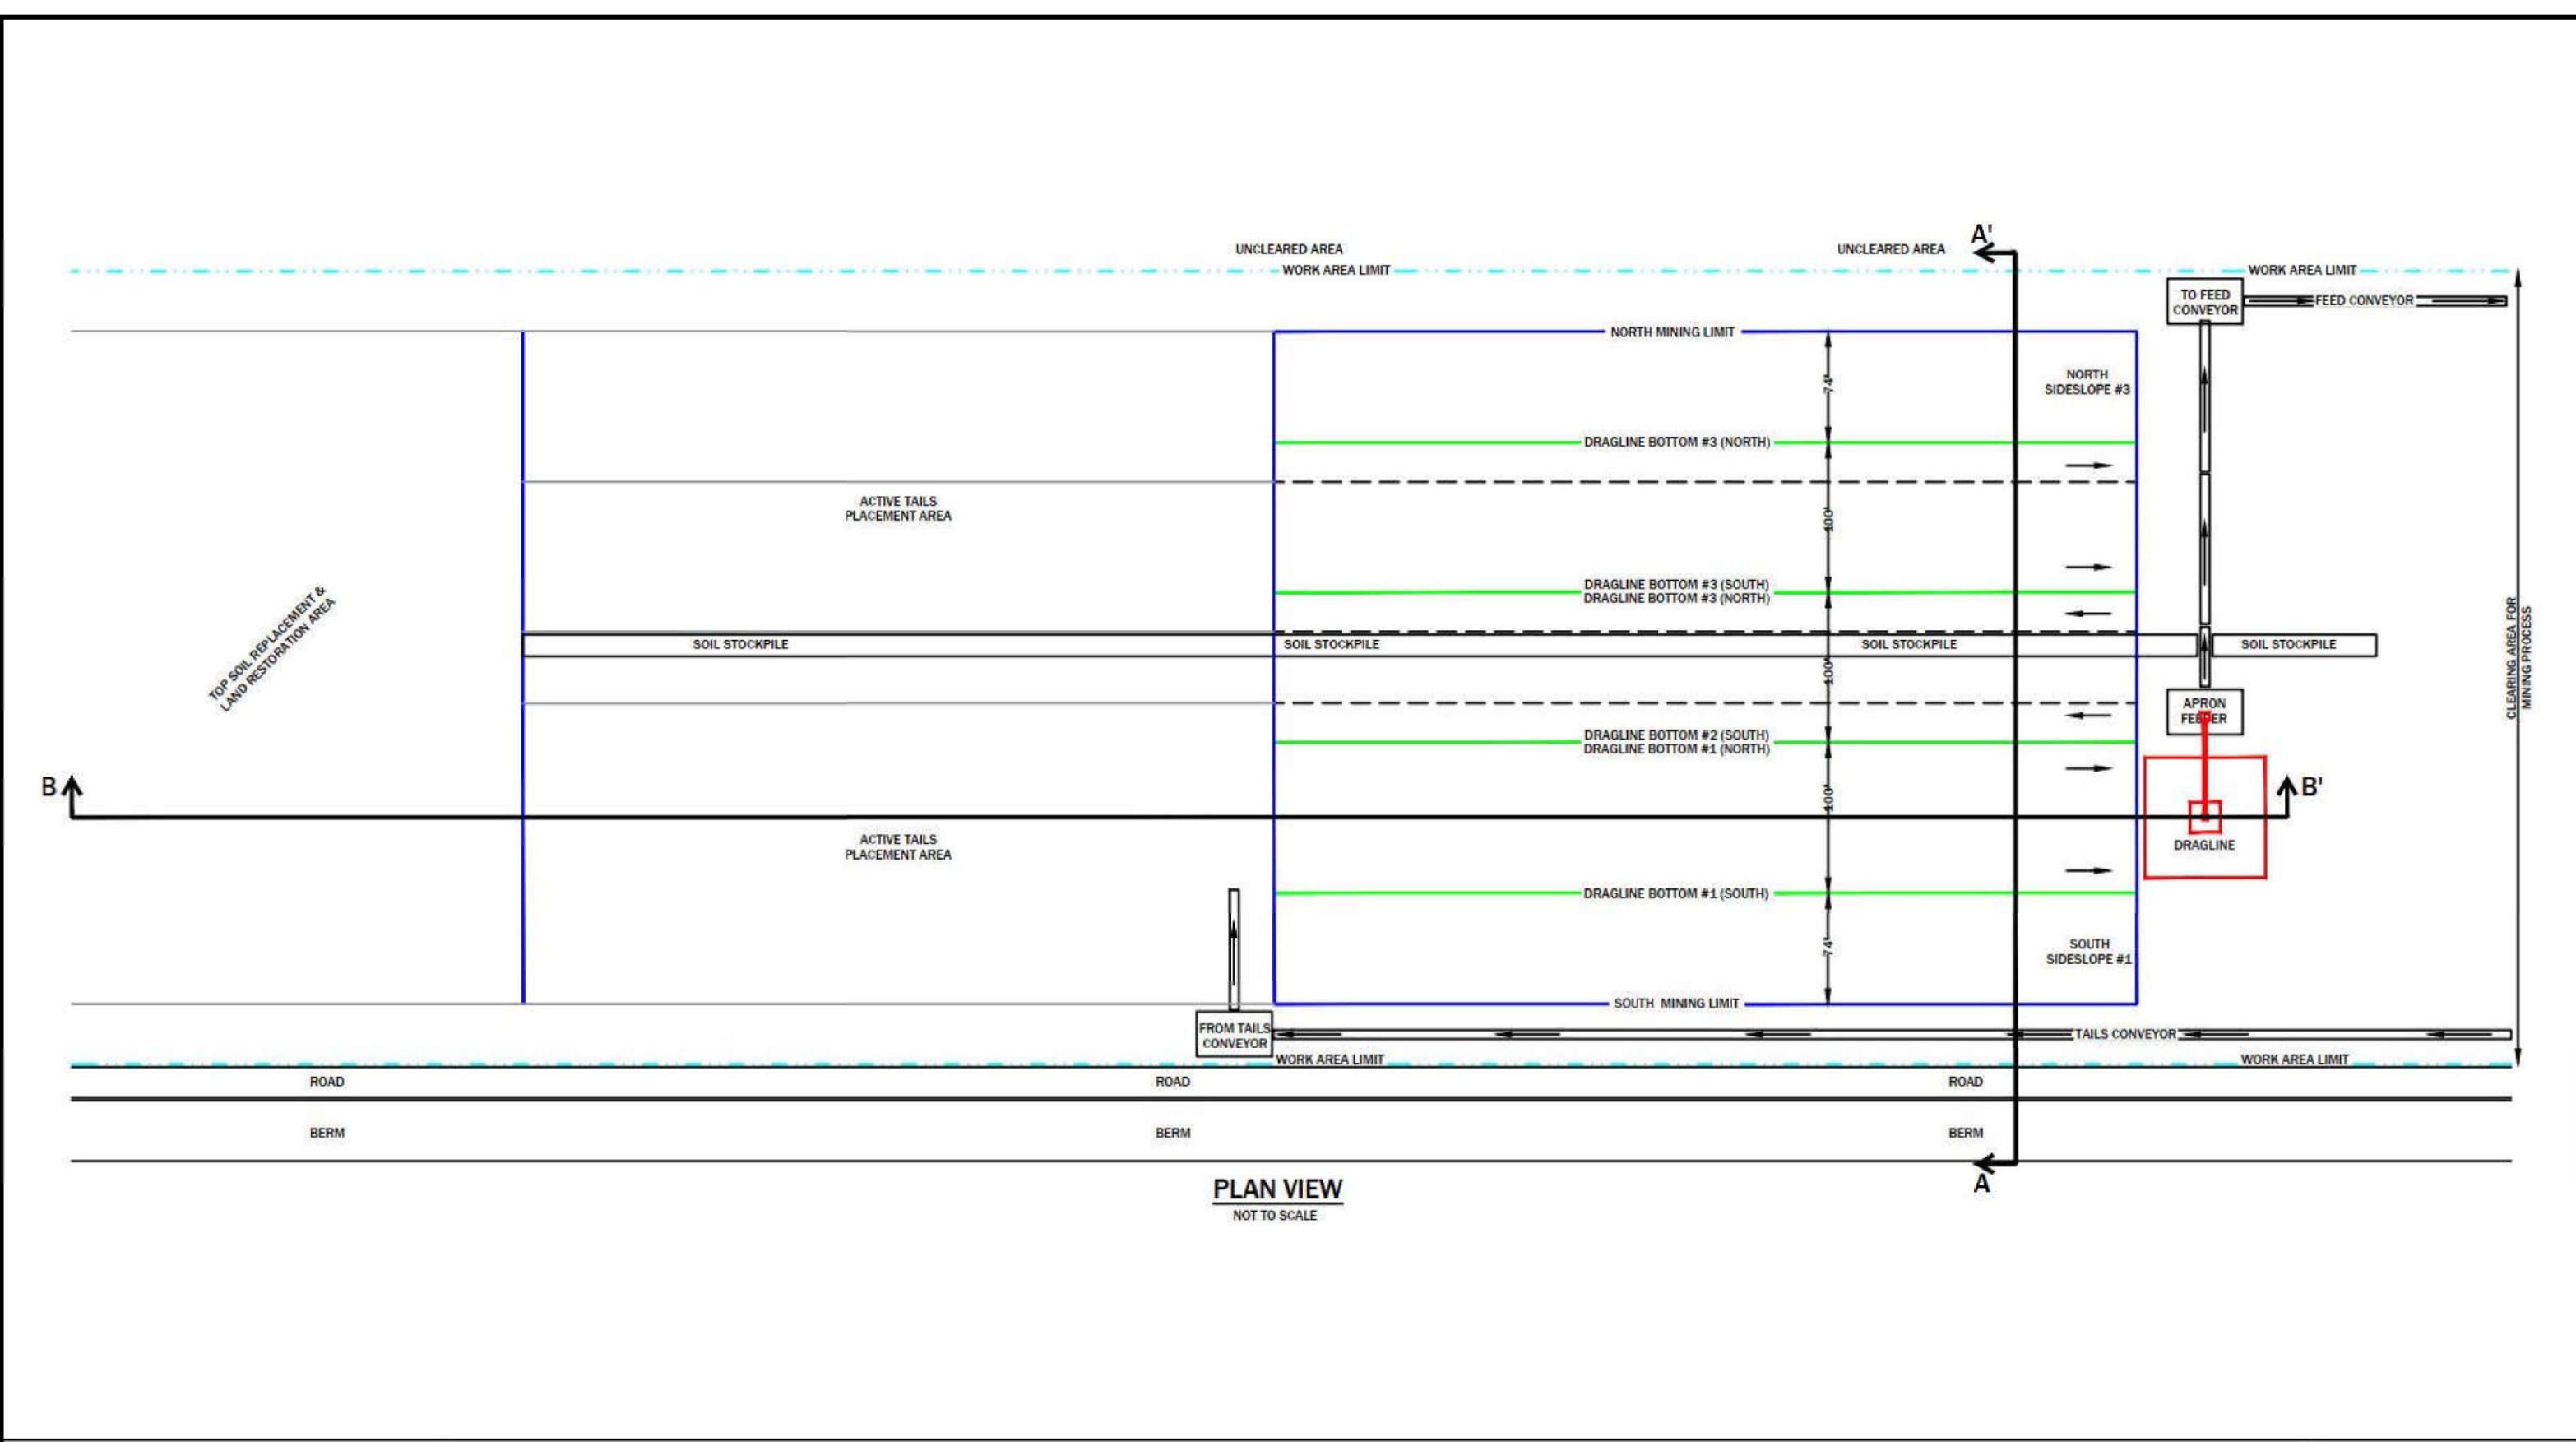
A: MINING PLAN VIEW (TYPICAL)
